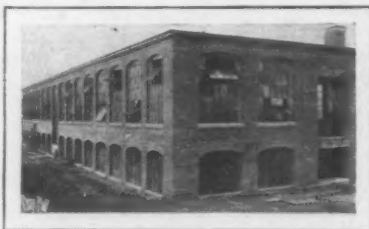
A Corner of the Factory, Showing the High Walled Basement Which Provides Abundant Light
